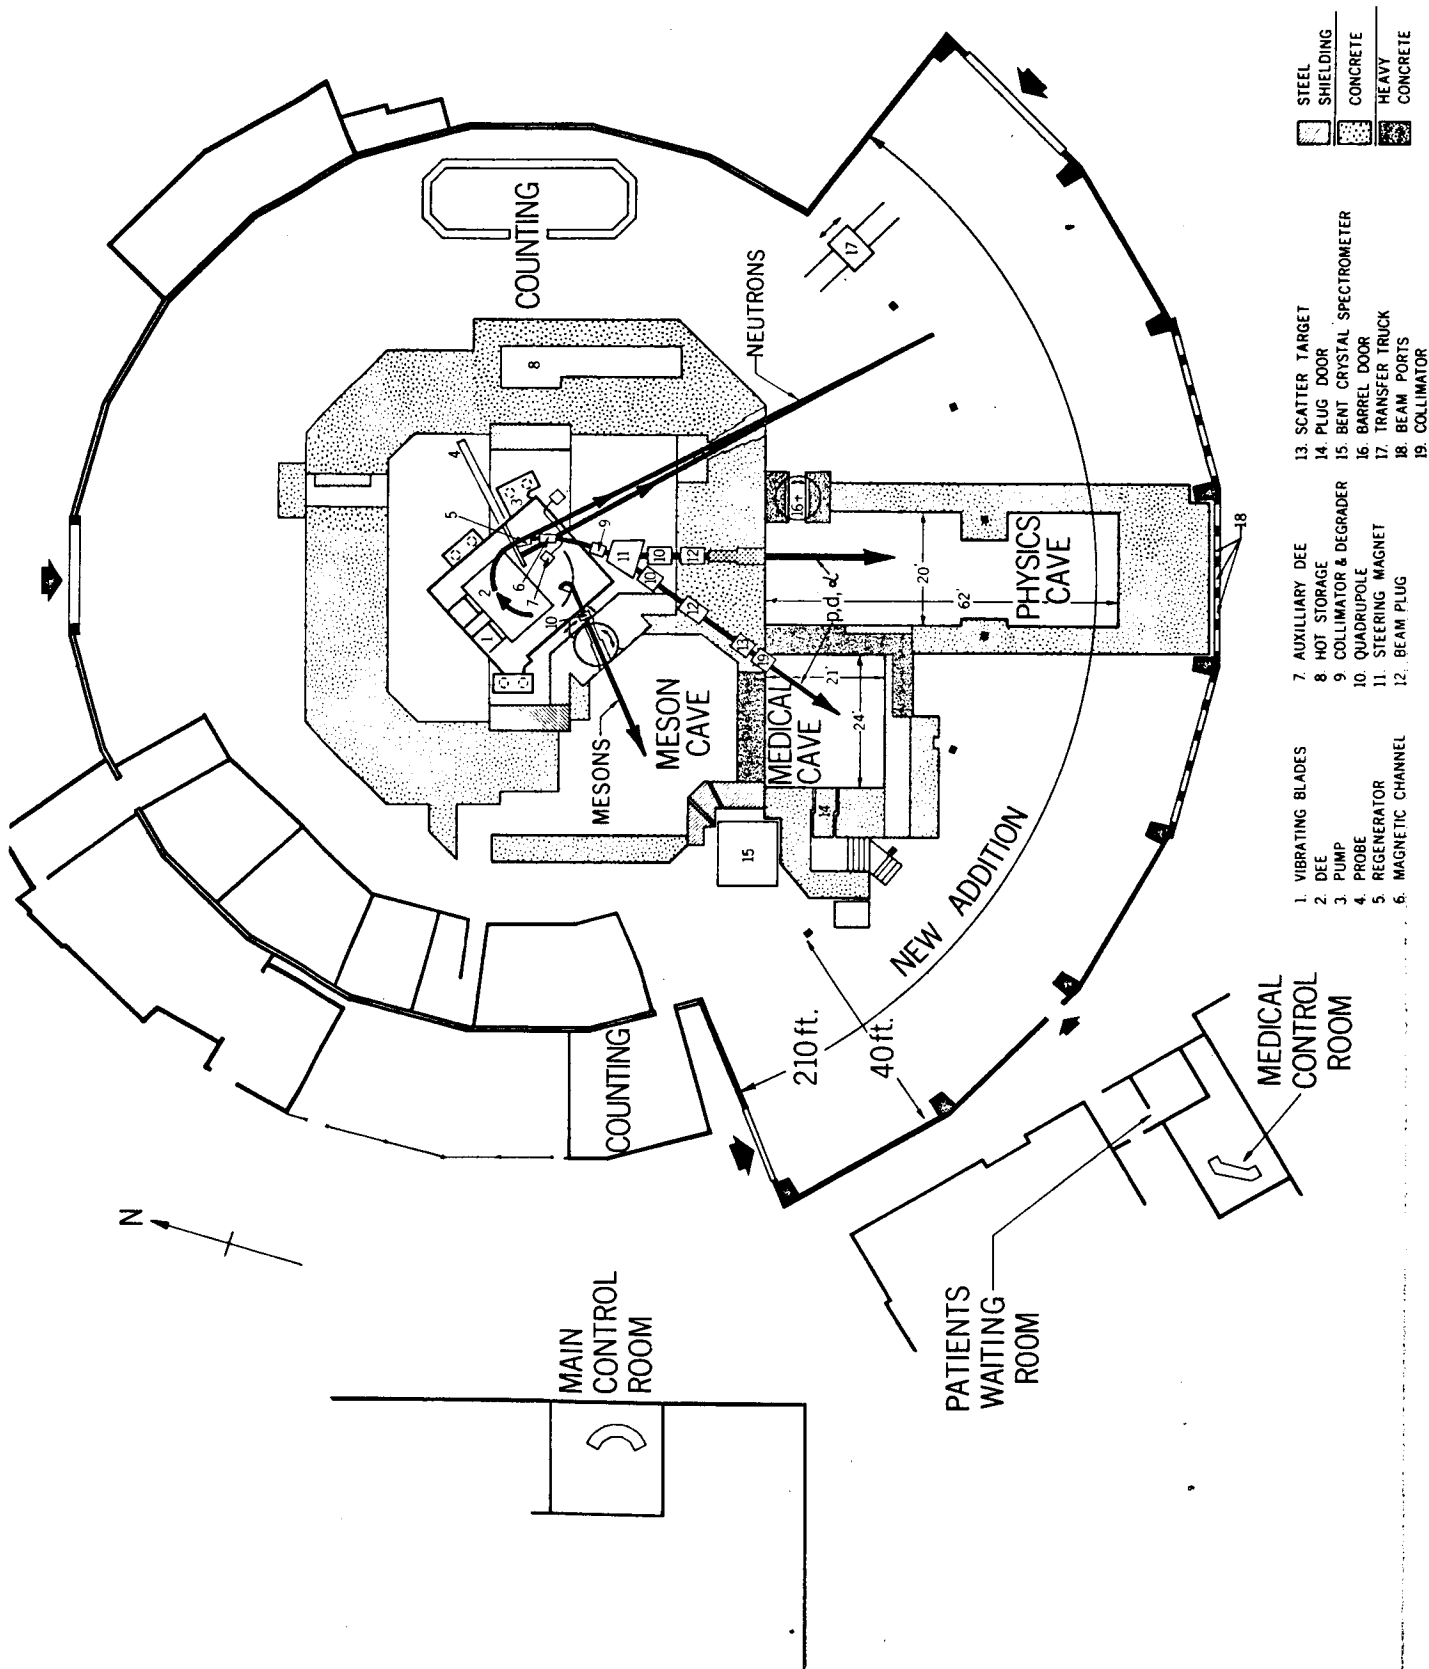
Schematic plan view of the 131 inch cyclotron and building showing the new experimental facilities.
